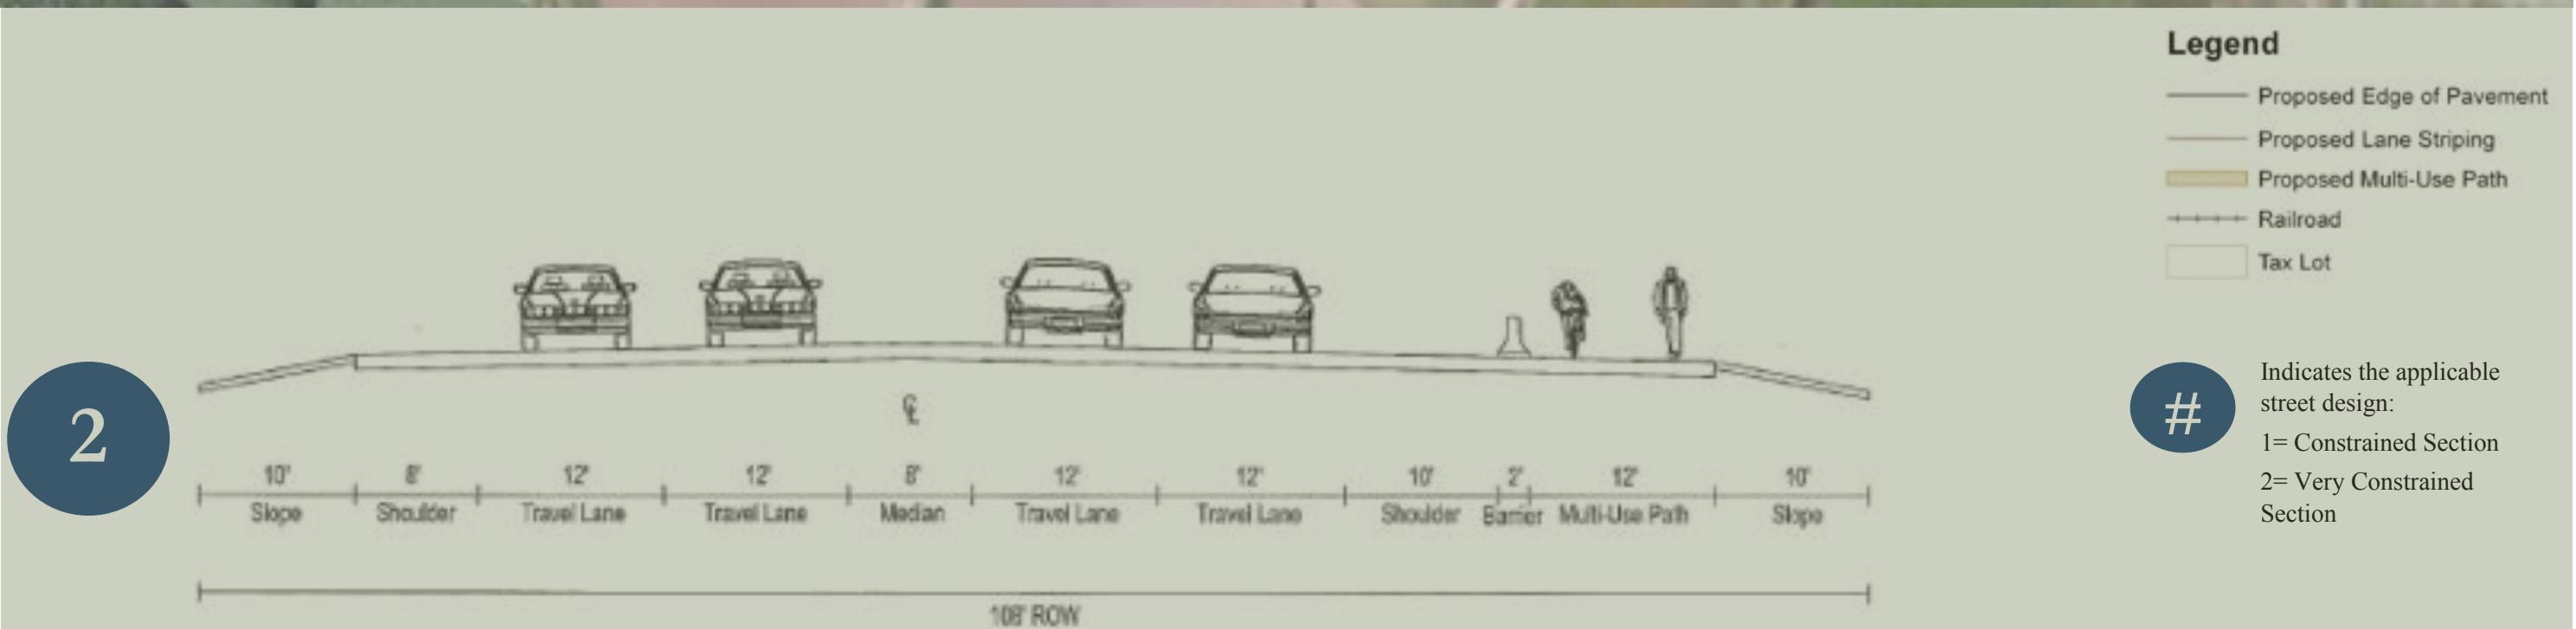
Recommended Corridor Plan: West of Fisher Road to east of Richmond Street
